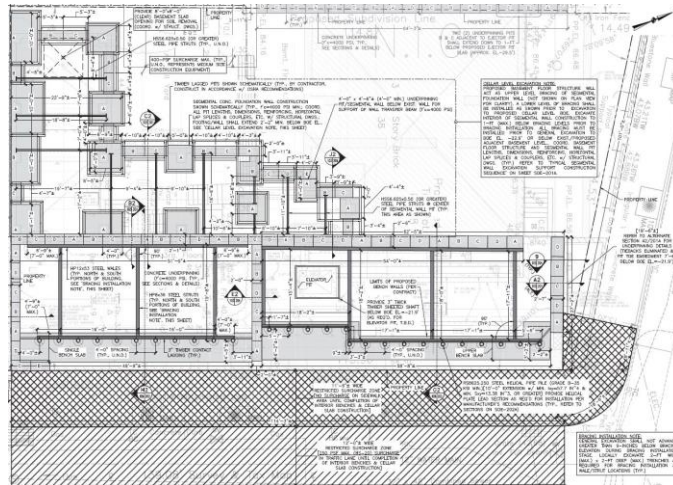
1860 Wing Proposed Condominiums Underpinning Plan
